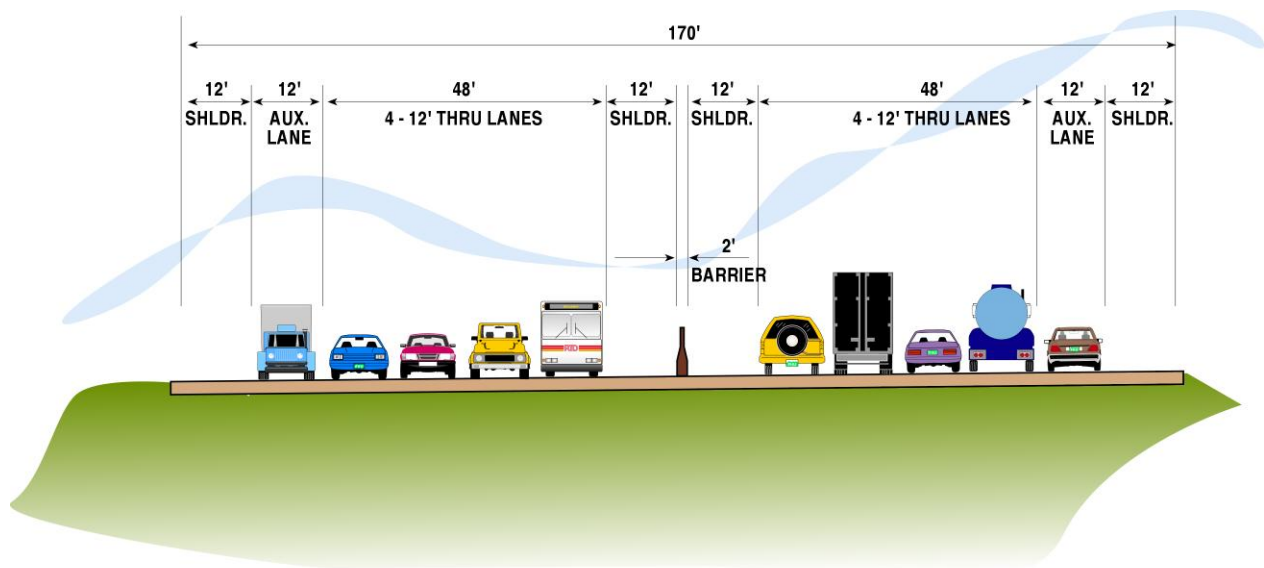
System Alternative 1, I-25 Typical Section, Broadway to Santa Fe Drive
